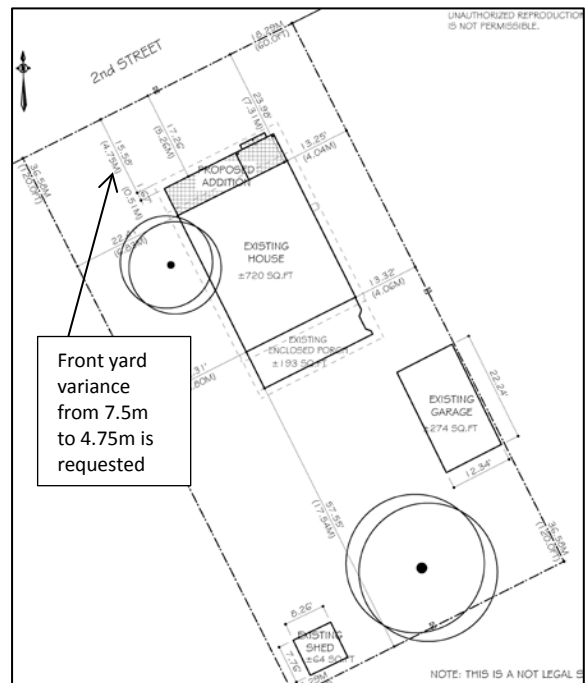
Site plan showing structures on the property and proposed addition to the front façade of the residence.
